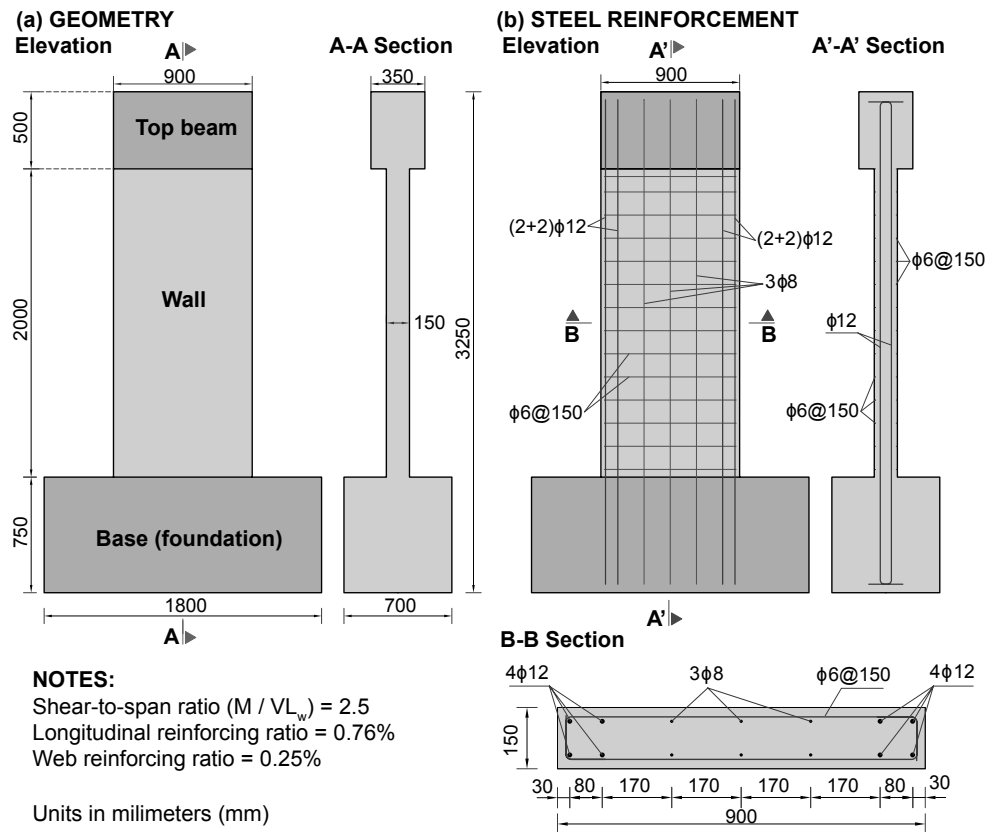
Prototype wall: (a) geometry, (b) steel reinforcement.
